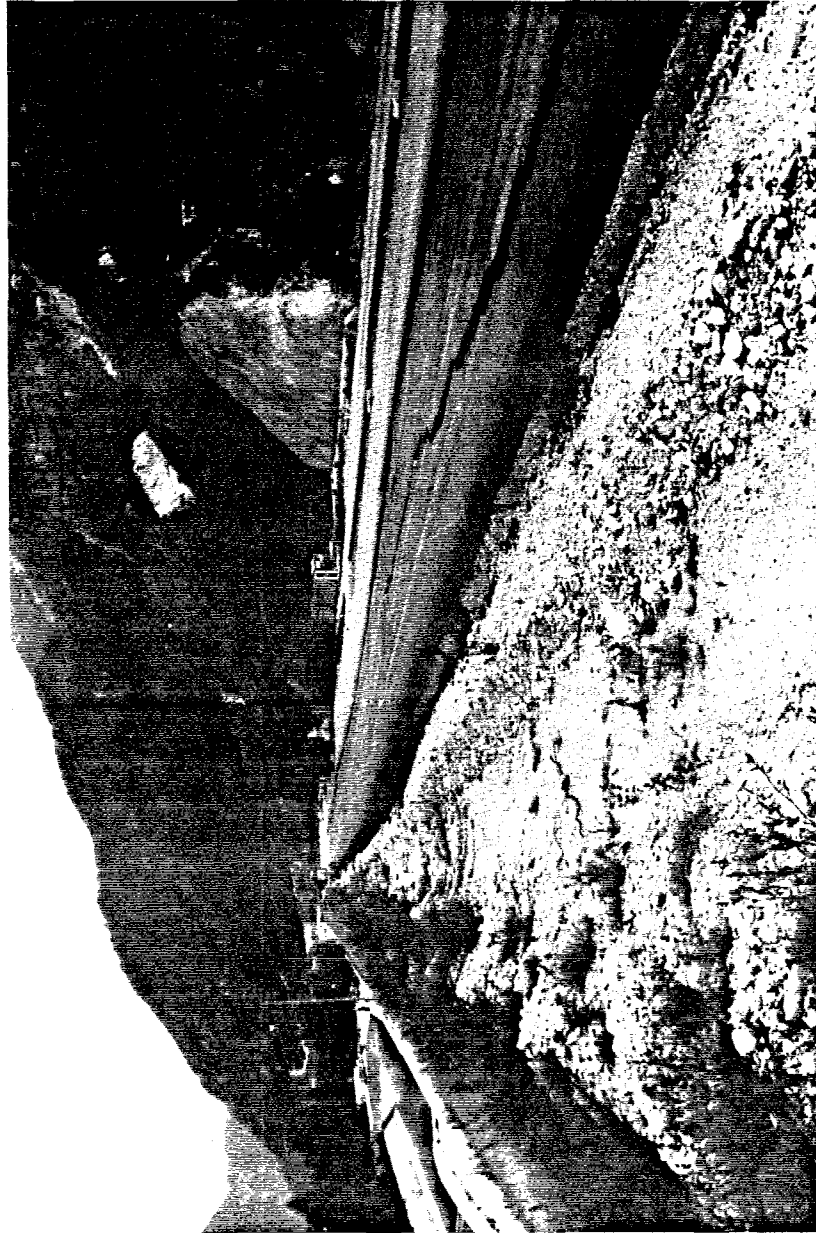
UDINE--CARNIA--TARVISIO HIGHWAY, ROAD CRACKING DUE TO EMBANKMENT WALL DAMAGE -- FROM (10)
